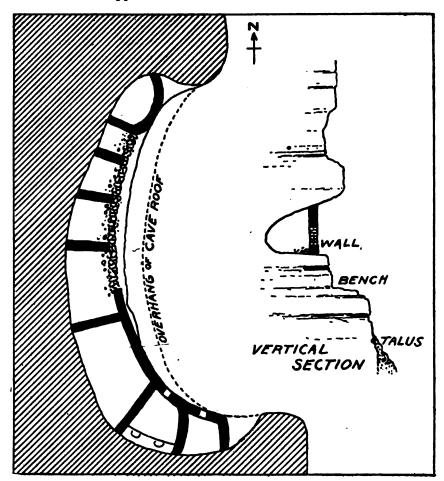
Ground plan and section of ledge-house near Jordan's ranch (height of front wall about 50 feet).
